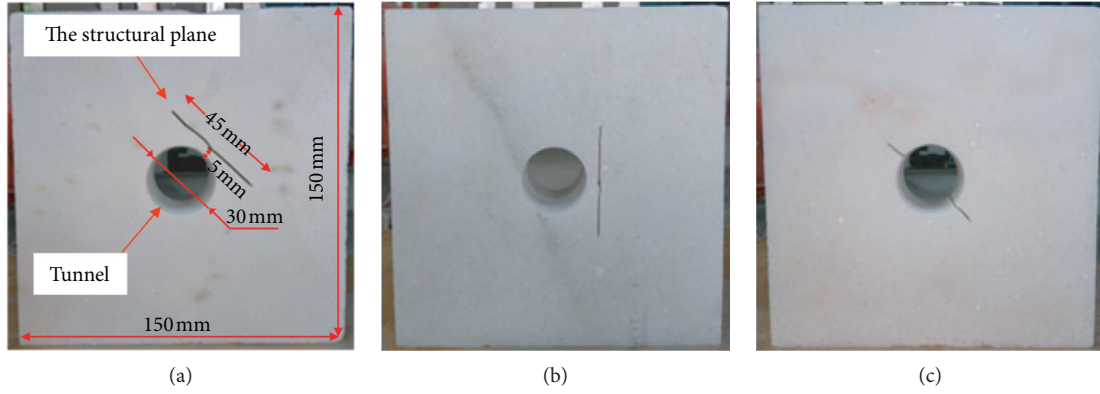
Three types of marble model samples. (a) The structural plane located in the tunnel spandrel. (b) The structural plane located in the tunnel sidewall. (c) The structural plane intersected with the tunnel.
